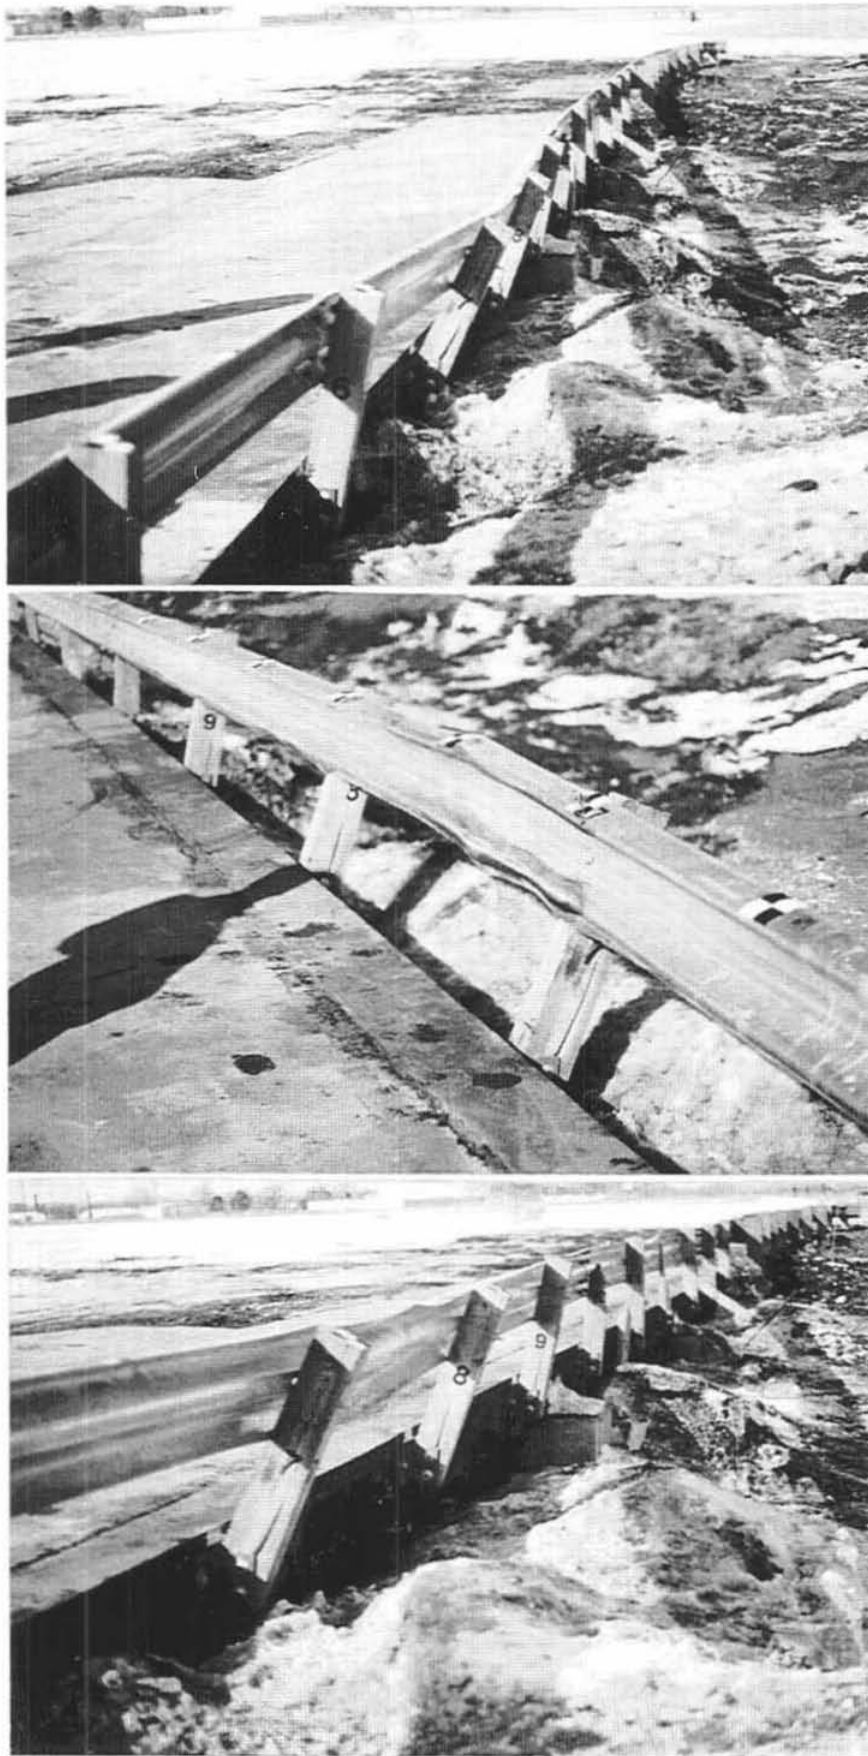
Bridge Rail Damage, Test LVBR-1
